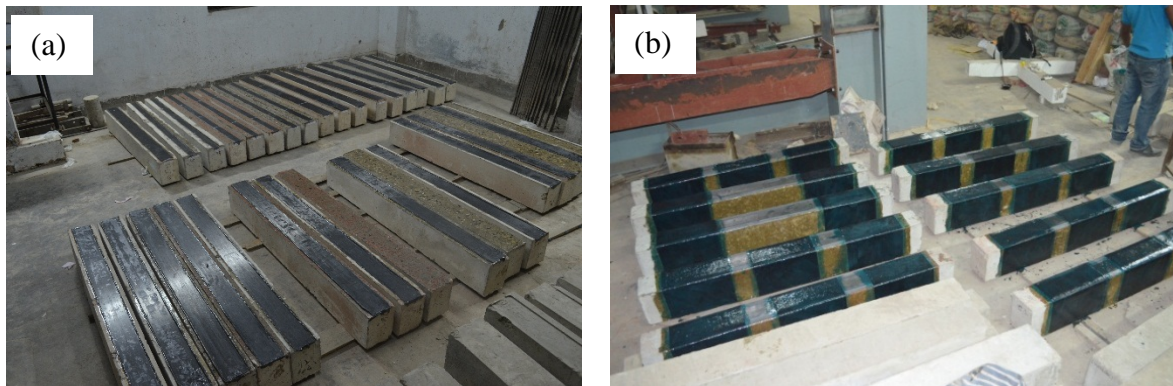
Test specimens: (a) beams strengthened with laminated CFRP plates (AT1 and AT2) and (b) beams strengthened with laminated CFRP plates and U-clamp anchorages (AT3b–d).
